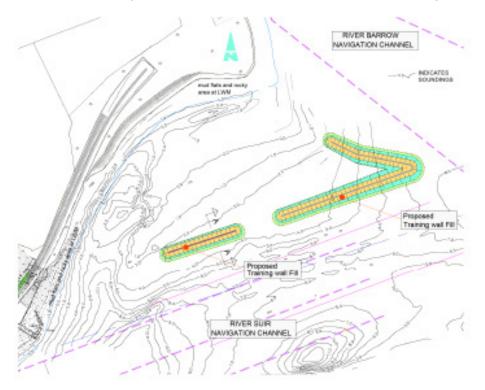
Proposed layout of the rubble mound structure training walls
